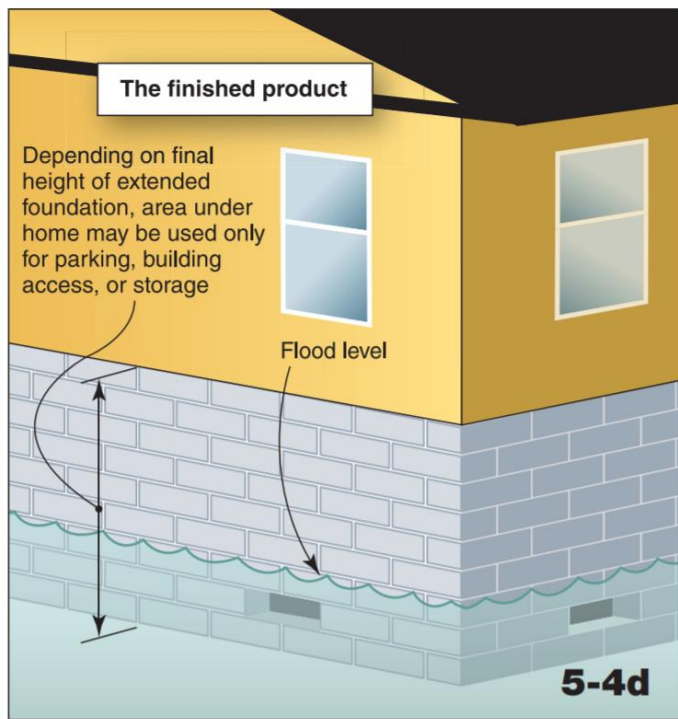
Elevation of a basement home on extended foundation walls (FEMA, 2014)
